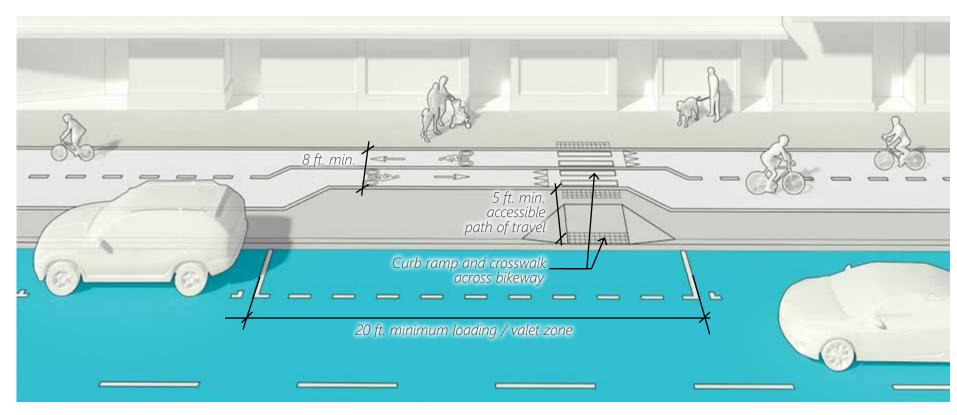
Two-Way, Sidewalk-Level, Class IV Bikeway at Loading or Valet Zone.
